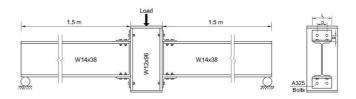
a) Test setup configuration and Connection parameters of A2 & A1 specimens
